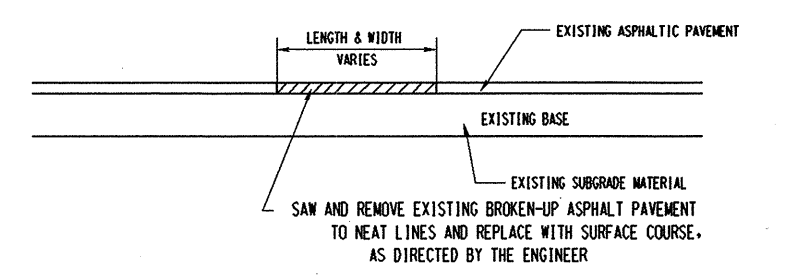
DETAILS OF REPAIRING EXISTING PAVEMENT PRIOR TO RESURFACING FOR FULL DEPTH AND MILLING
